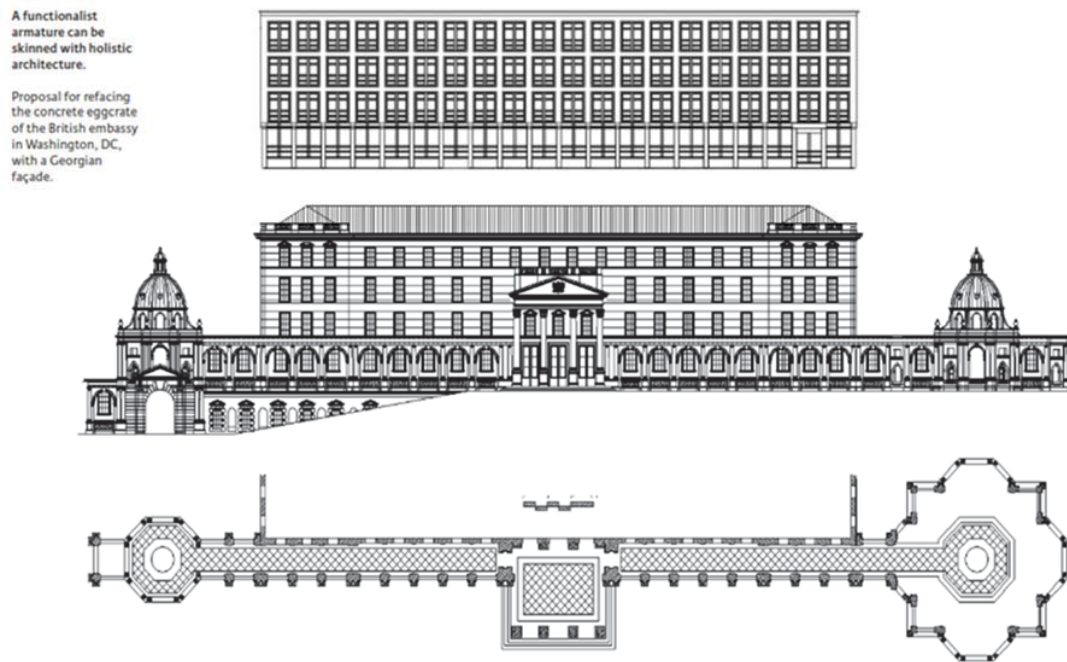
A functionalist concrete eggcrate design can be completed with biophilic architecture. Proposal for facing with a Georgian façade the utilitarian British embassy structure in Washington, DC. Figure by N. H. Buras, 2021.
